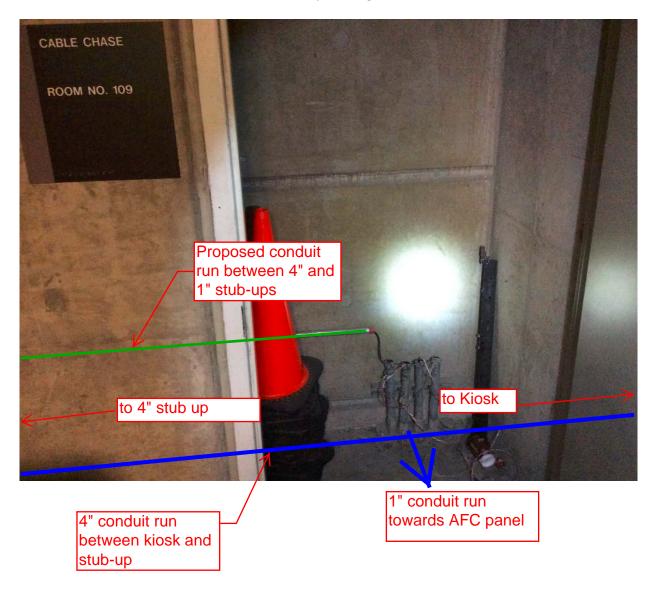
B35 New York Ave South: AFC Panel near 1 inch stub up
